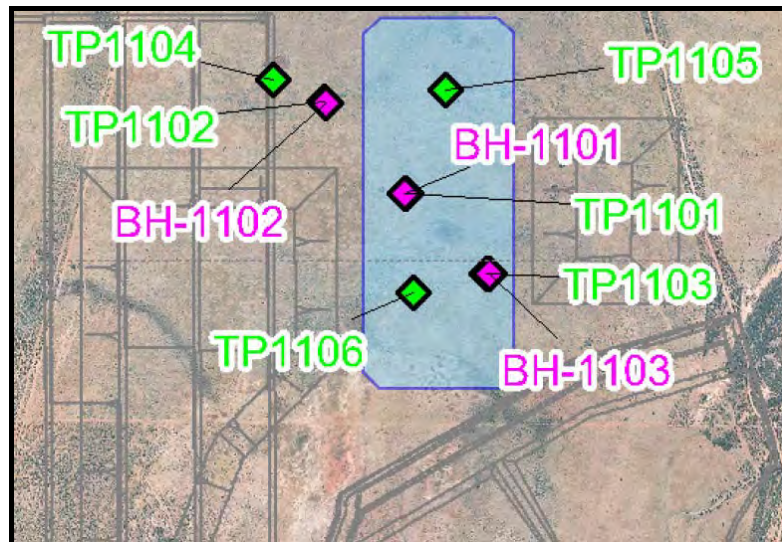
EPTSF Site 1 Boreholes and Test Pit Locations
